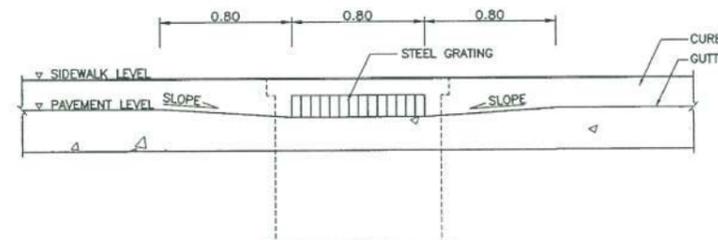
DETAIL OF CURB AND GUTTER OR CURB AT RAISED MEDIAN
